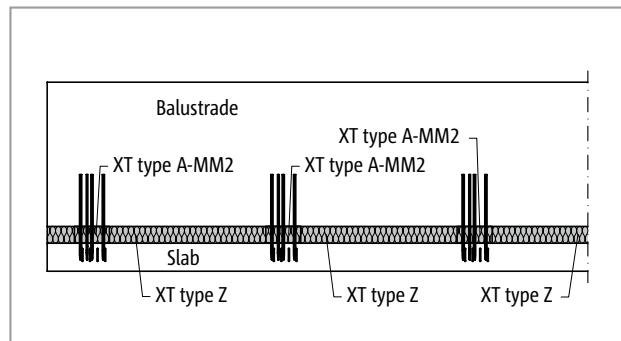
Schöck Isokorb® XT type A, Z: Parapet (XT type A-MM2)
